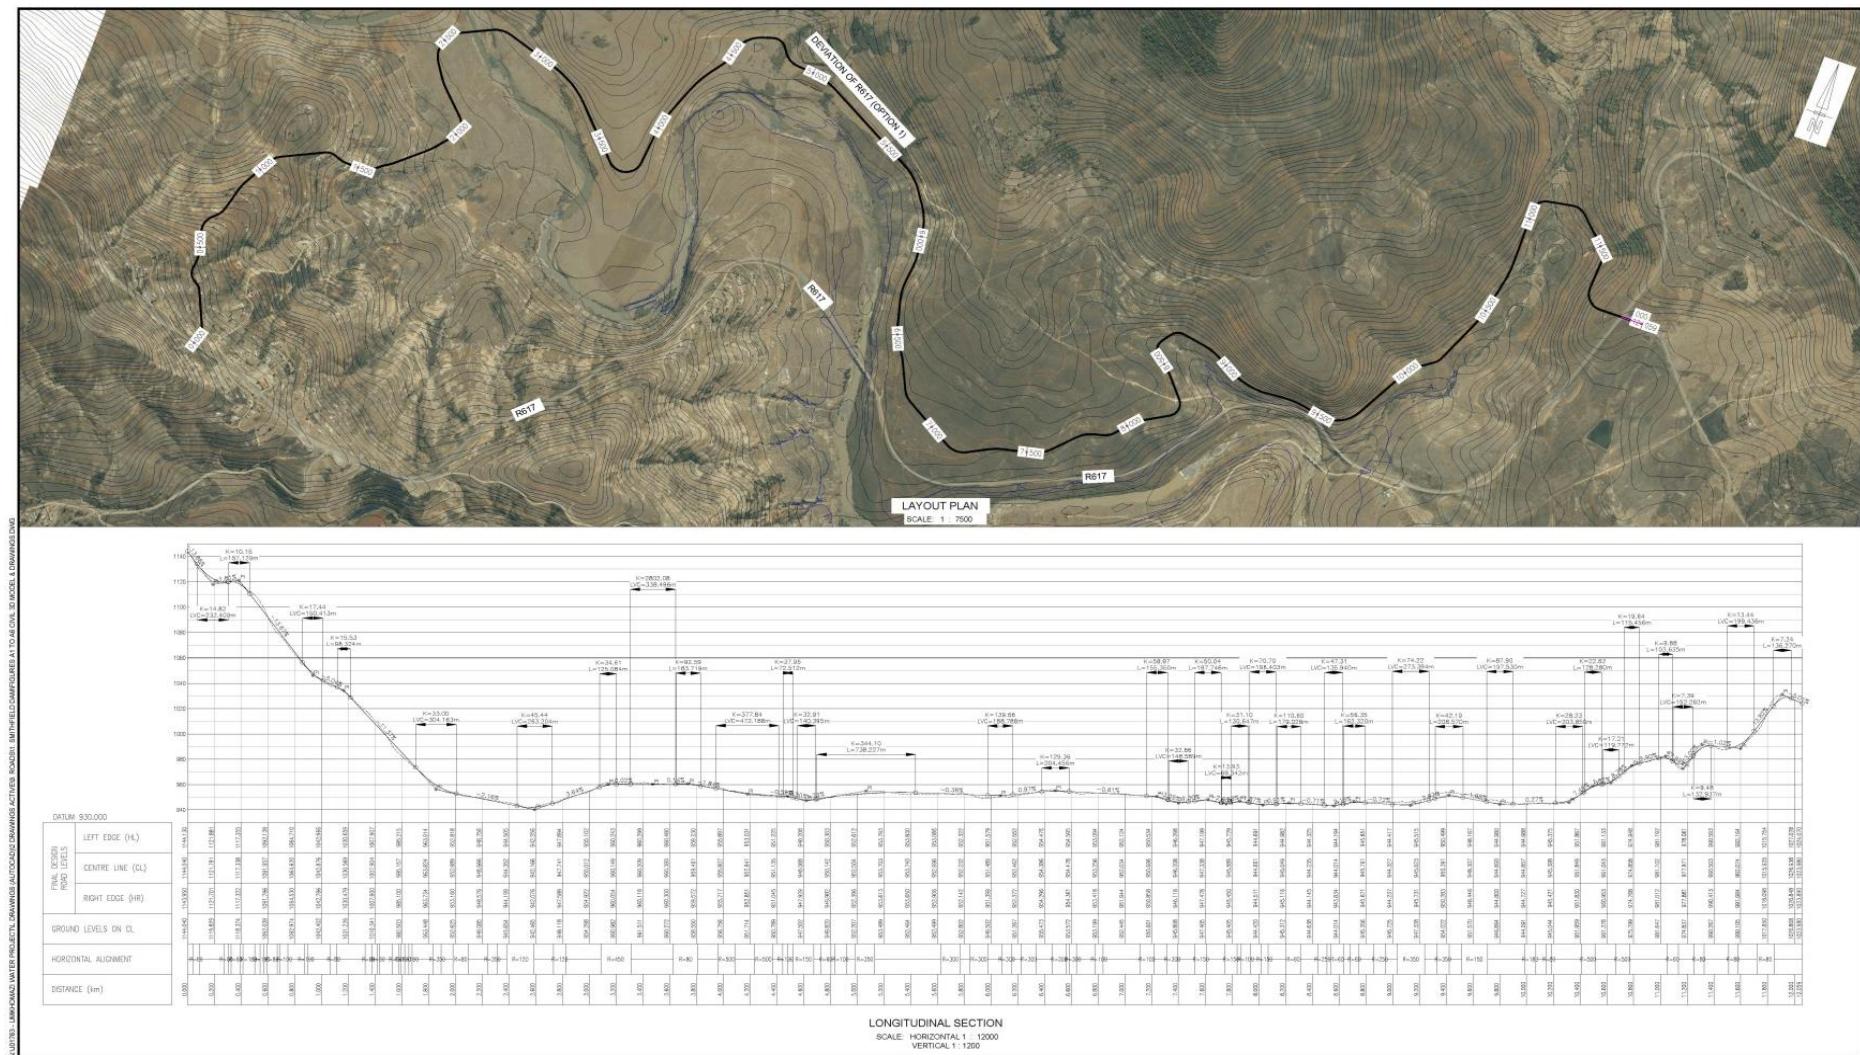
B.1: Smithfield Dam – Layout plan and longitudinal section of the deviation of road R617
